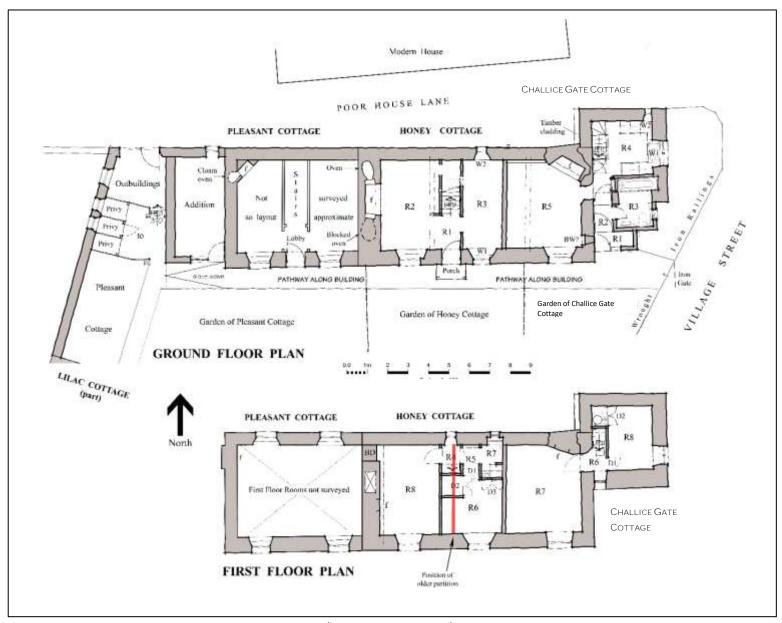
GROUND- AND FIRST-FLOOR PLAN OF THE THREE COTTAGES (BASED ON SUPPLIED PLANS).
